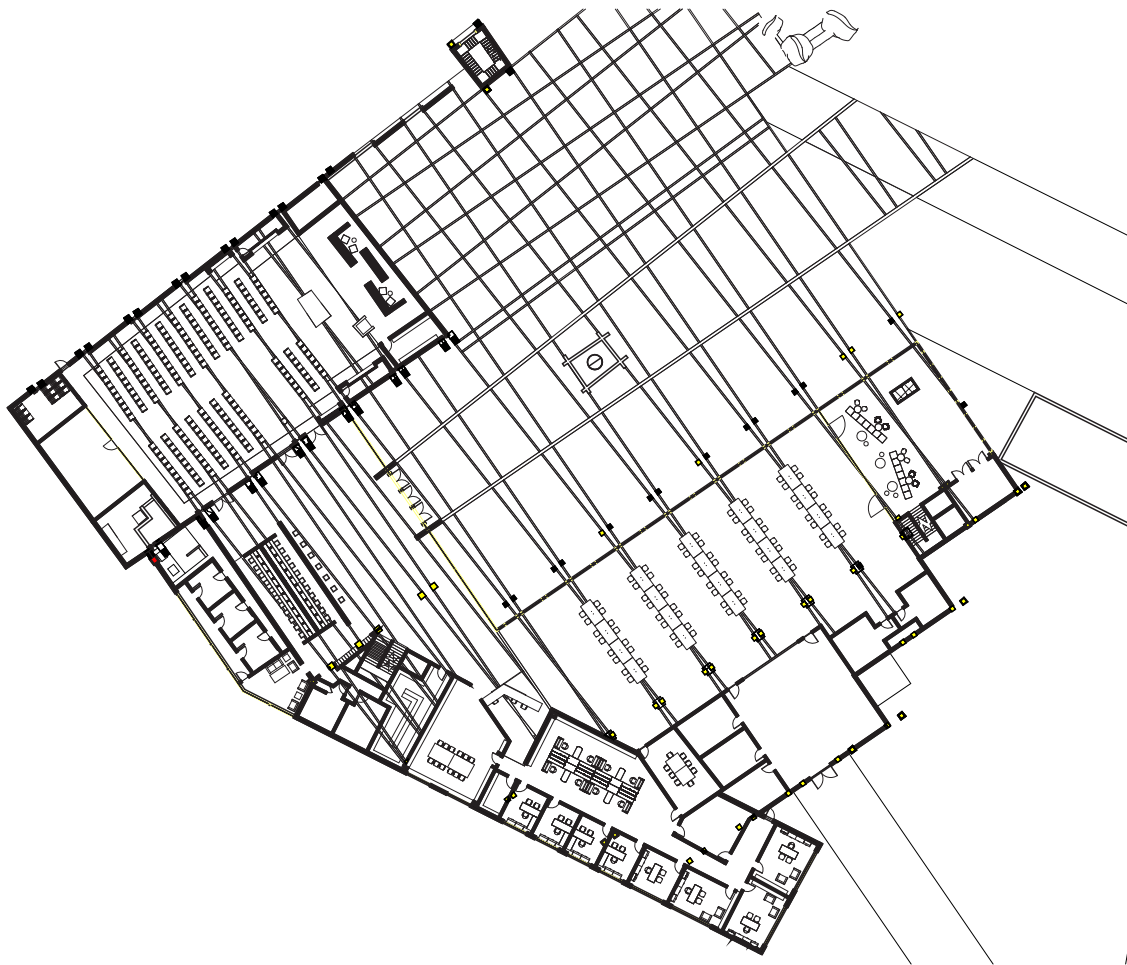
Prayer Lines and Geometry in Floor Plans
